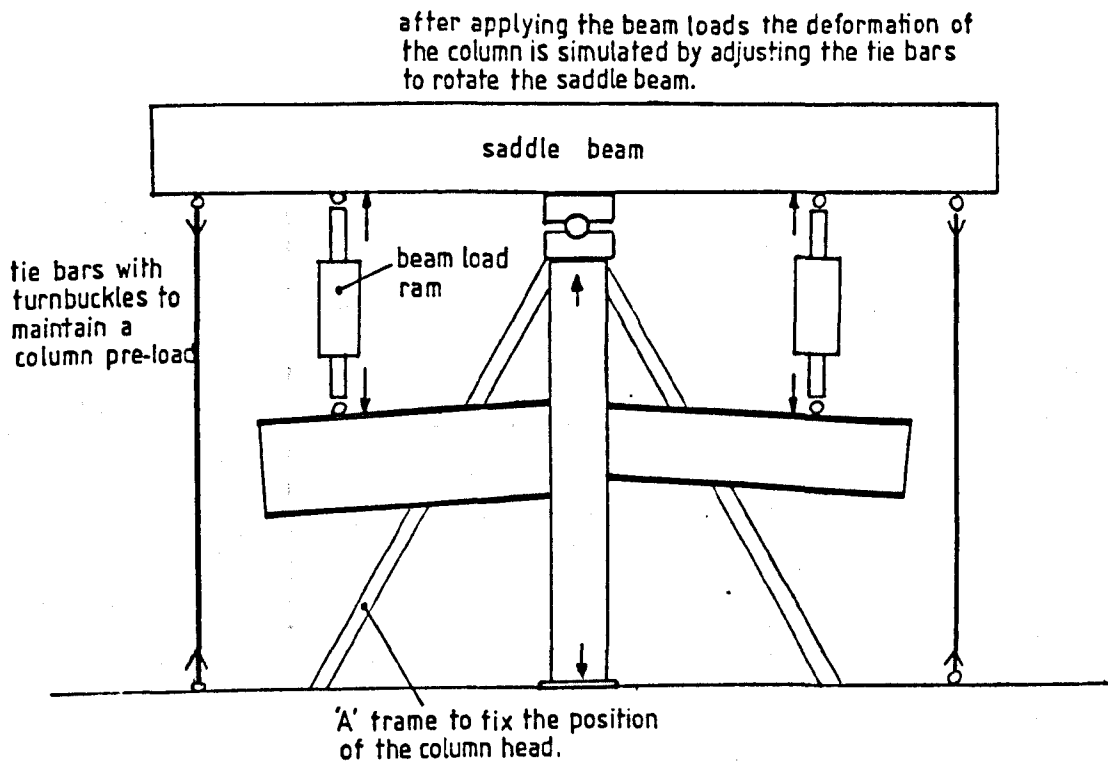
Possible connection test arrangement which would permit connection rotations resulting from column deformation.
